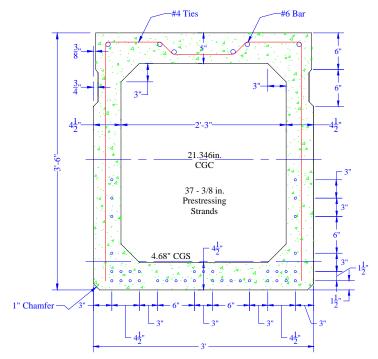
Span 2 Beam 4 of Clearfield Creek Bridge as per Structural Drawings
